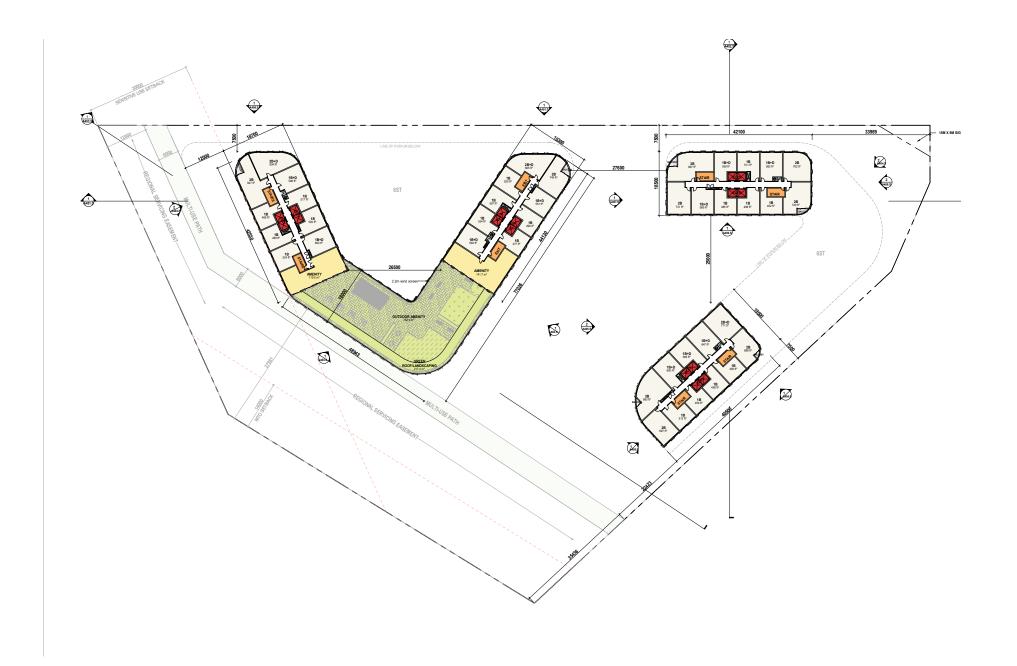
Level 9 Floor Plan (BDP. QUADRANGLE ARCHITECTS LTD.)
